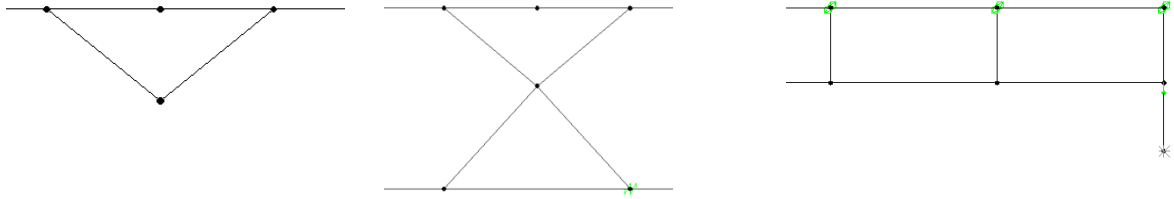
Left: Cross section made using the section designer option. The light weight roof element modeled as a beam element. Figure 4b Right: The end-section of the beam element modeling the light weight roof element.
